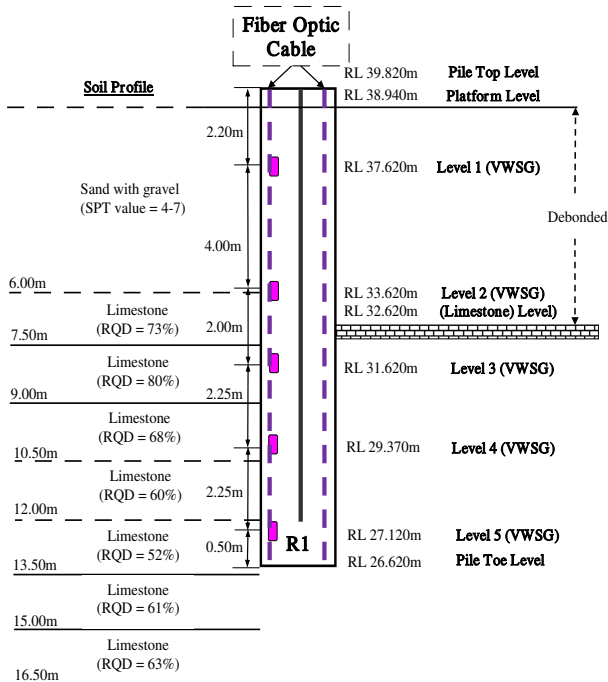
Instrumentation setup in test pile with 5 levels of strain gauges
